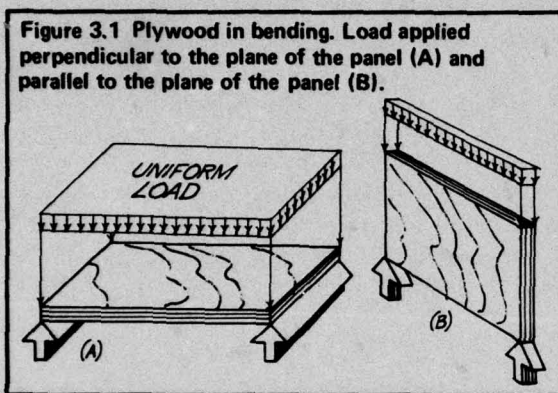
Plywood in bending. Load applied perpendicular to the plane of the panel (A) and parallel to the plane of the panel (B).
